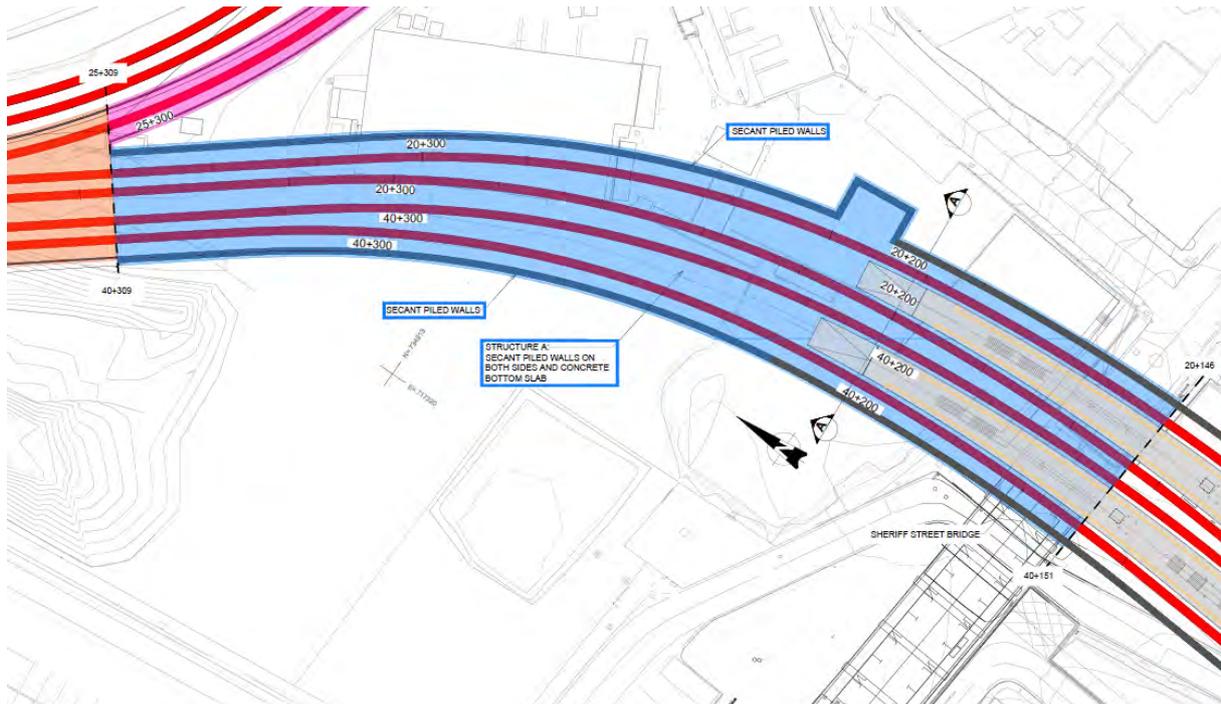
Spencer Dock proposed walls and protection slabs - Structure A
